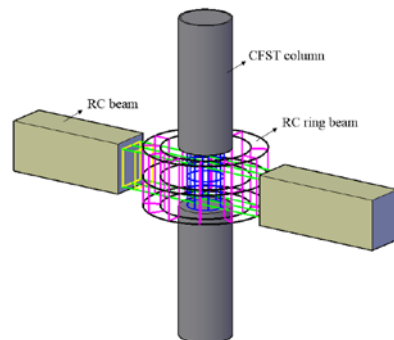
Schematic diagrams of reinforced concrete ring beam connection.
